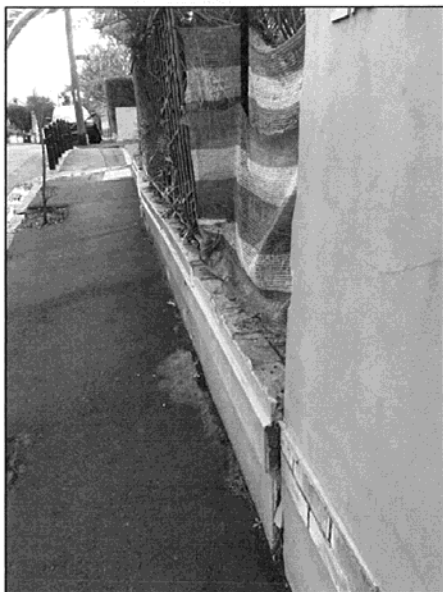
Retaining wall damage (opposite Tree 1 & 1a).
